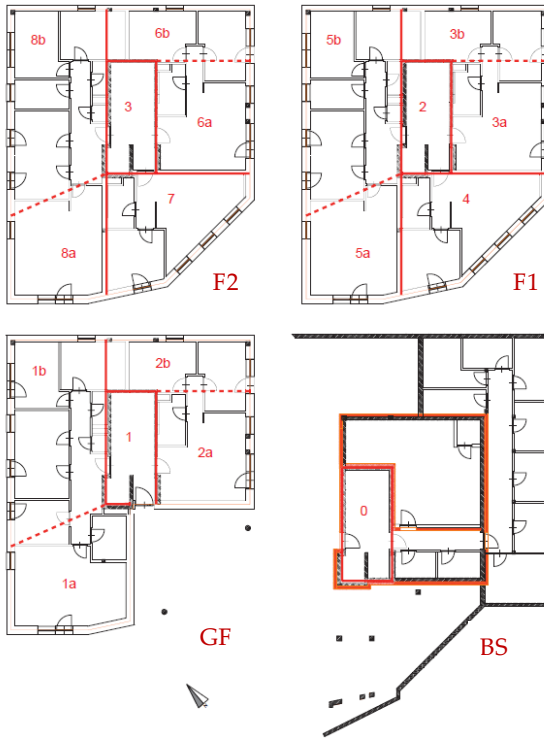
Zone partitioning of basement (BS), ground floor (GF), first (F1) and second (F2) floor
